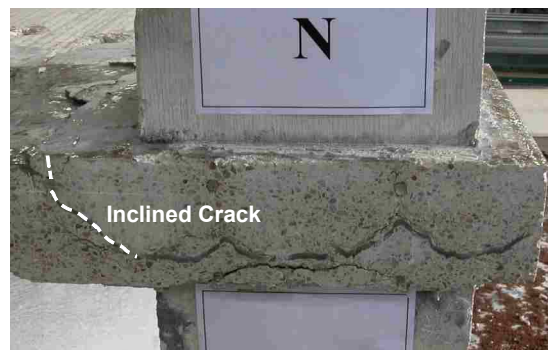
Inclined crack causing punching failure at a slab-column connection (Y. Tian, 2007)
